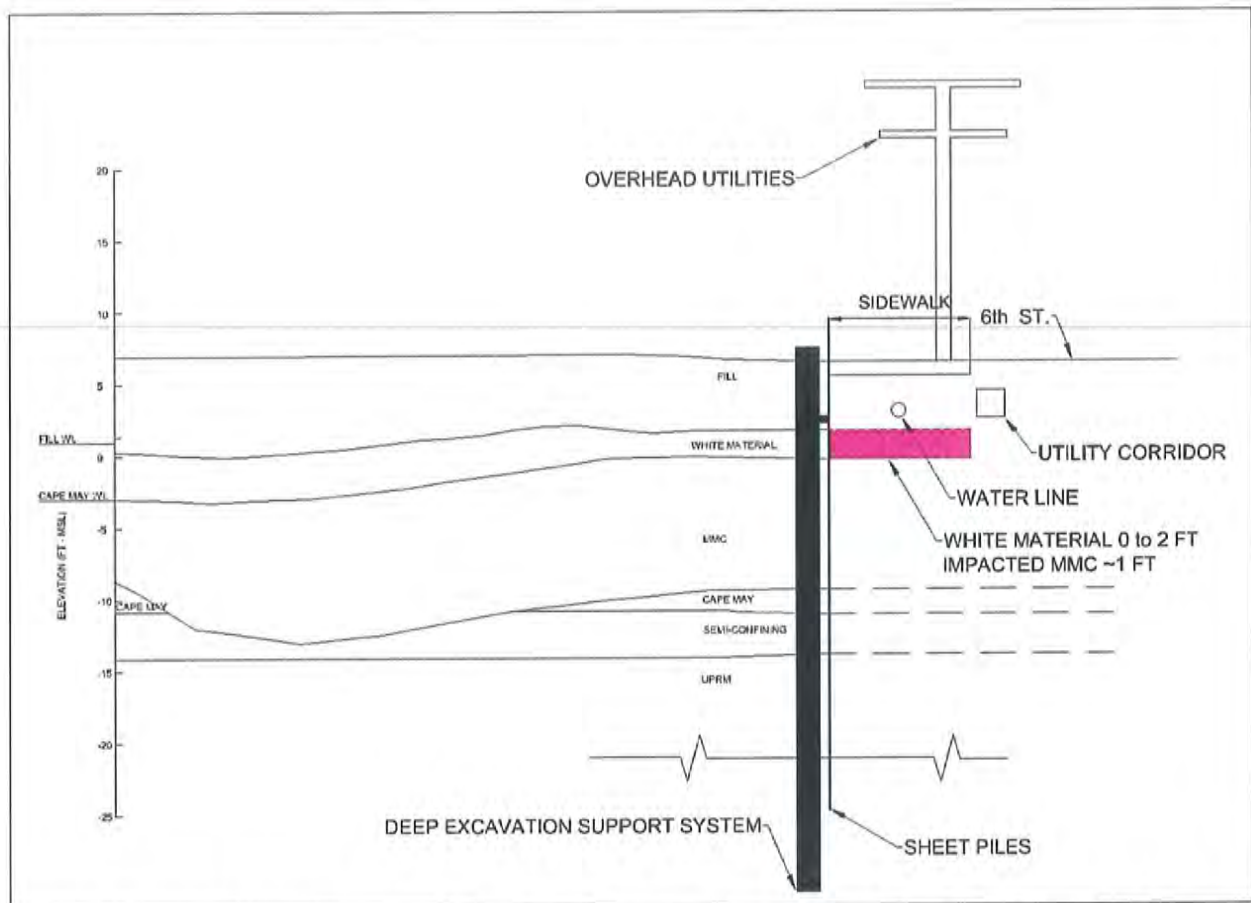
Section showing estimated extent of arsenic-impacted material left in-place below the South 6th Street sidewalk
